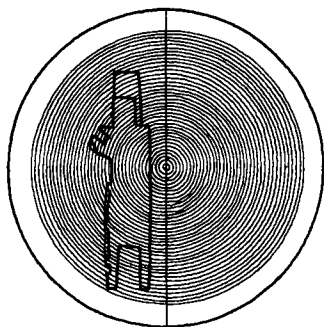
Wall-plate from the stave-church at Nr. Hørning built near the end of the 11th century. Two wall-plates of this type could be made from the same oak trunk. The upright stave planks were secured in a groove in the underside of the wall-plate. The edge of the roof was finished by a horizontal board fixed to the groove at the top of the wall-plate. The trenched tie-beams ride over the top of the wall-plate. Scale of the section 1:20. H.S. 1977.
